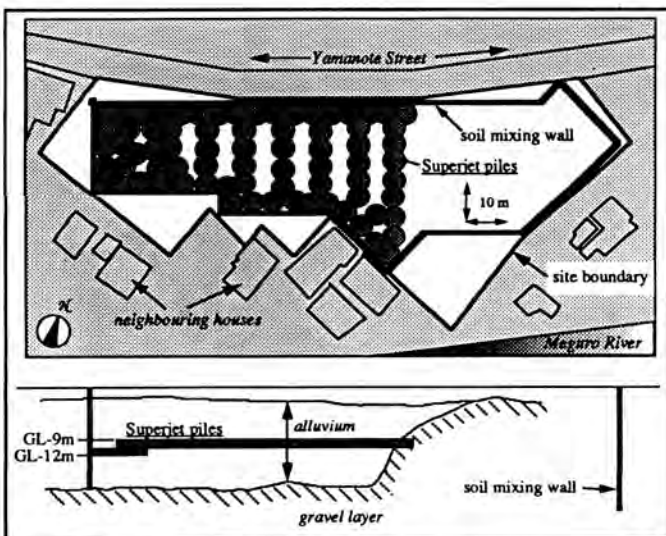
Plane and profile of the site located in Shinagawa Ward, Tokyo.
